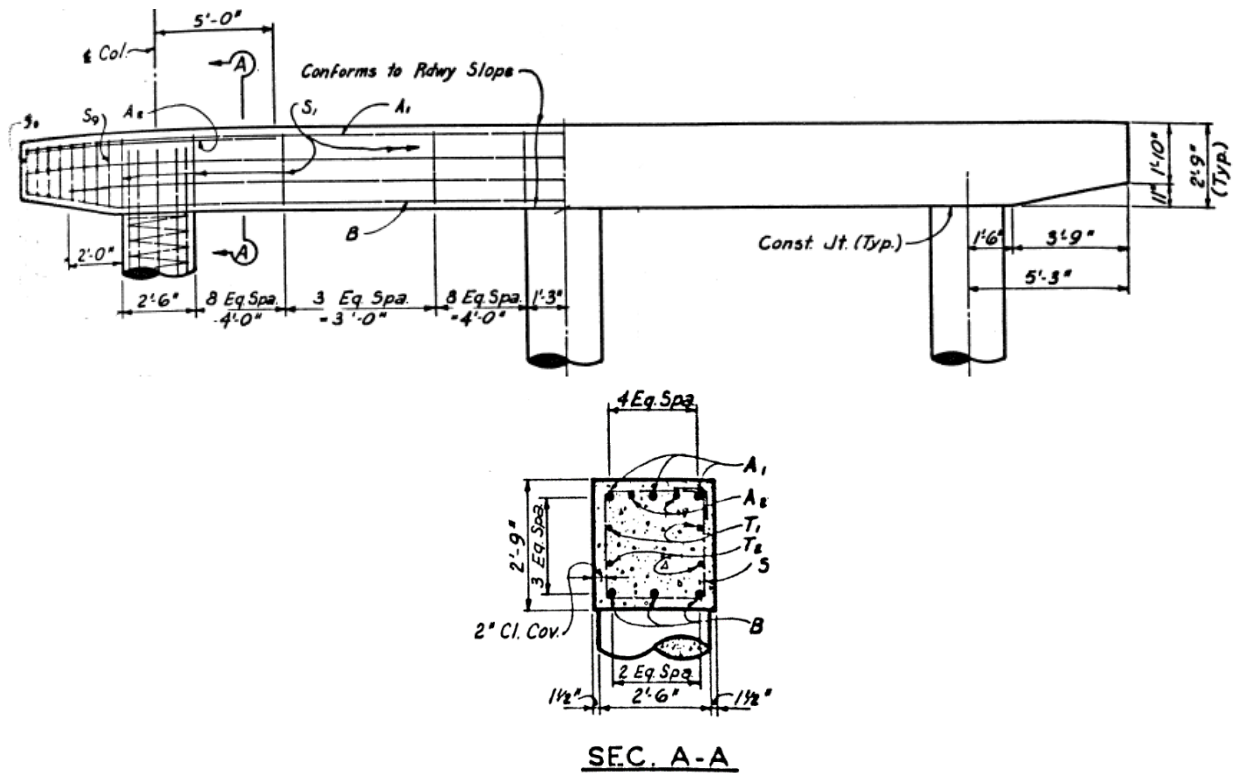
Typical bridge bent, and bent cap detail (TxDOT 1962)
